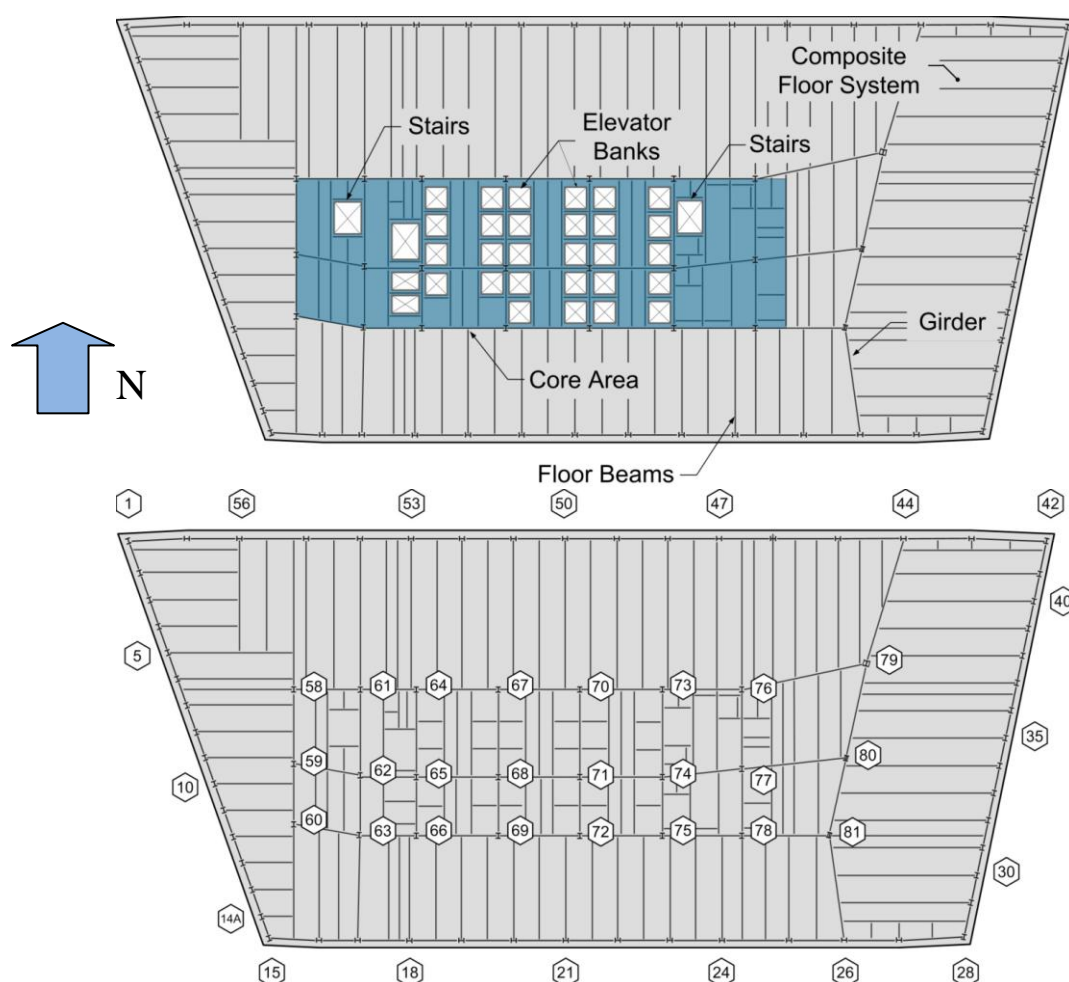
Typical floor framing plan (Floors 8 to 20 and 24 to 45) [2].
